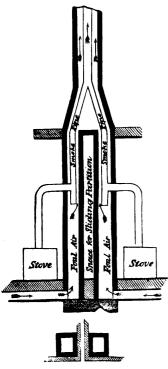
Plan and Section of Ventilating Shaft for Design.
